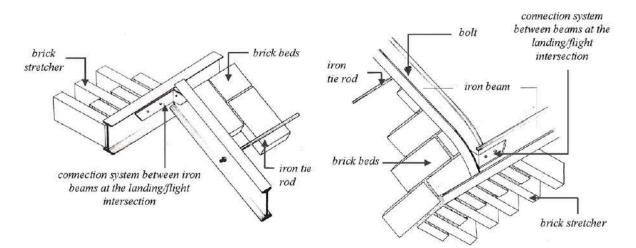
Details of brick masonry staircases with support/reinforcement metallic elements [9].
